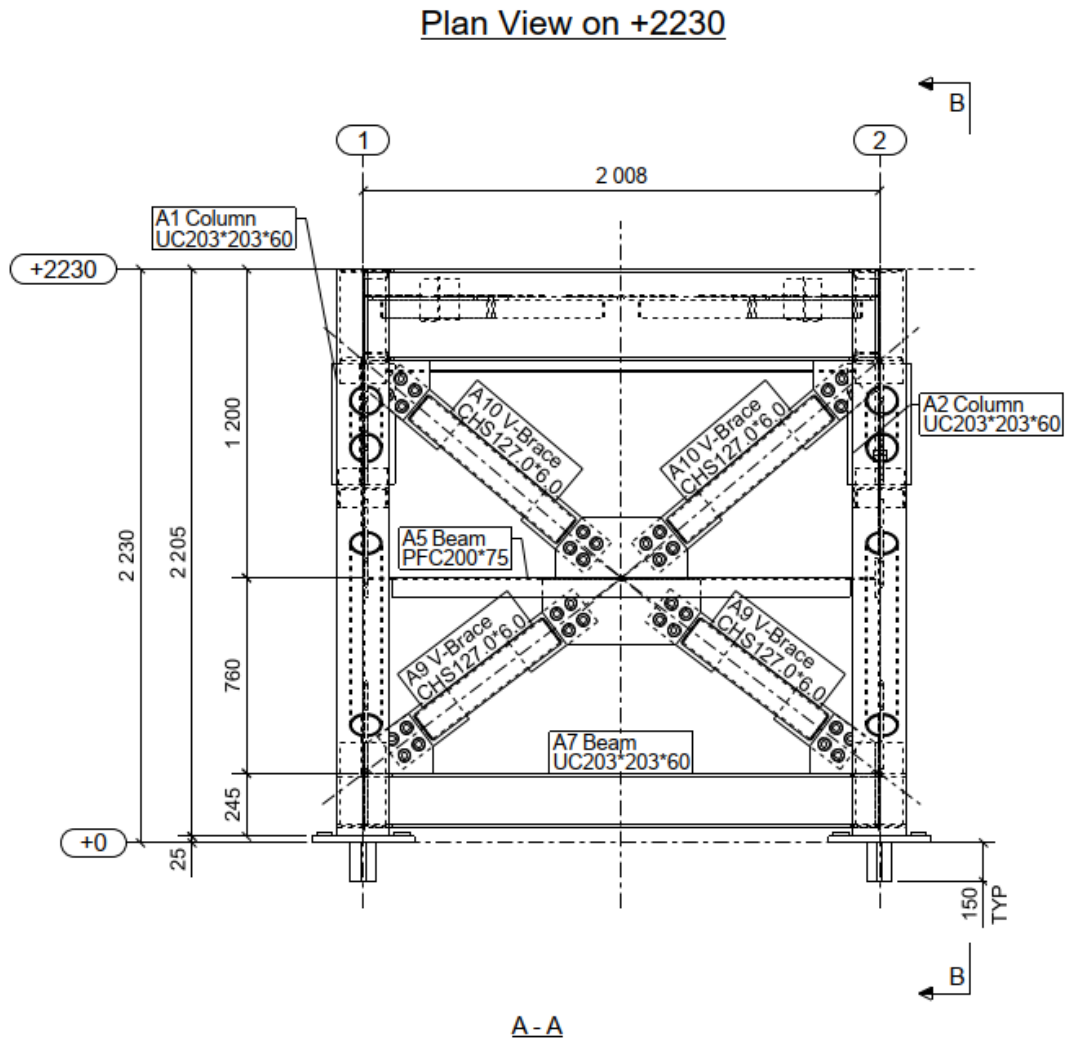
Site D Cross-braced CHS Member General Arrangement Elevation (Site D-C1)
